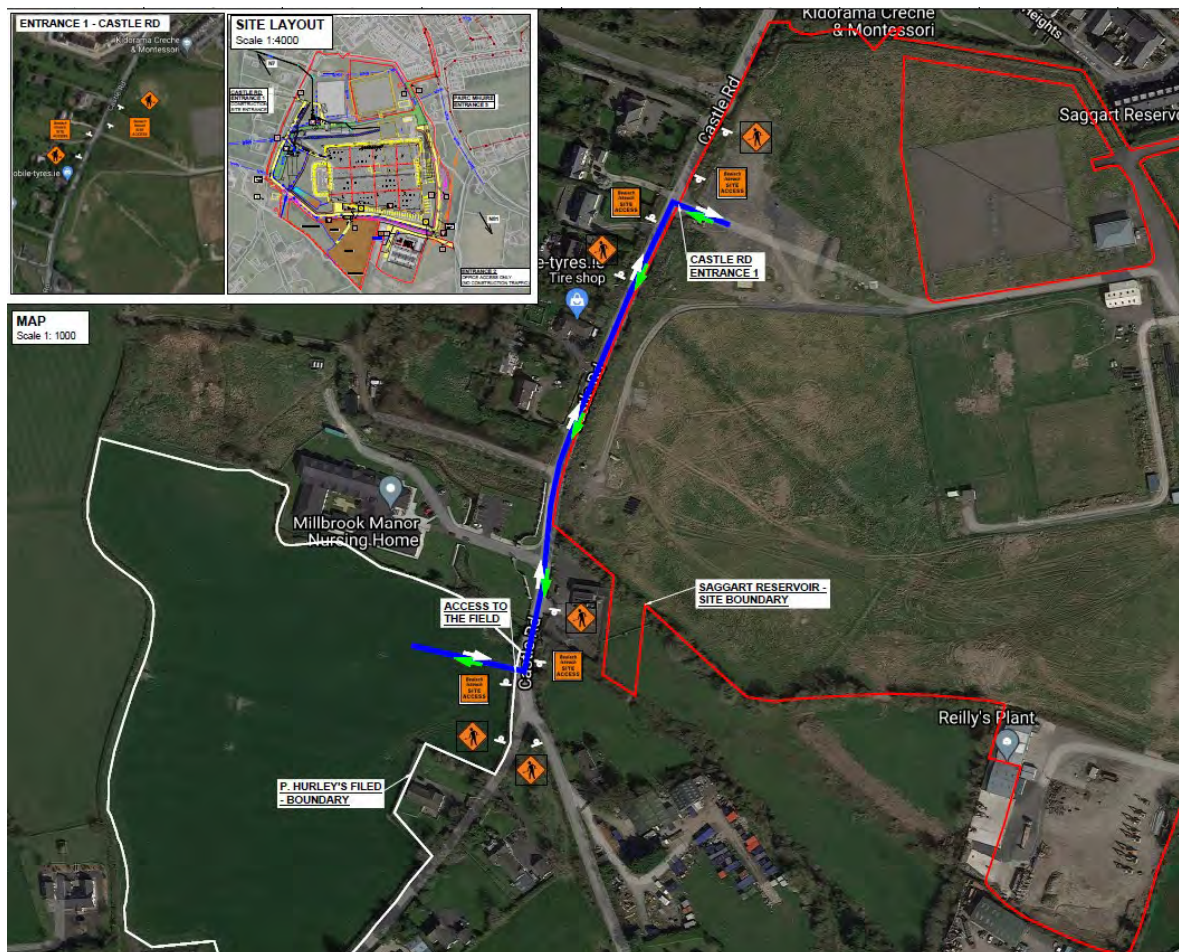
Site Access Route from the Main Construction Site of the Saggart Irish Water Reservoir.
